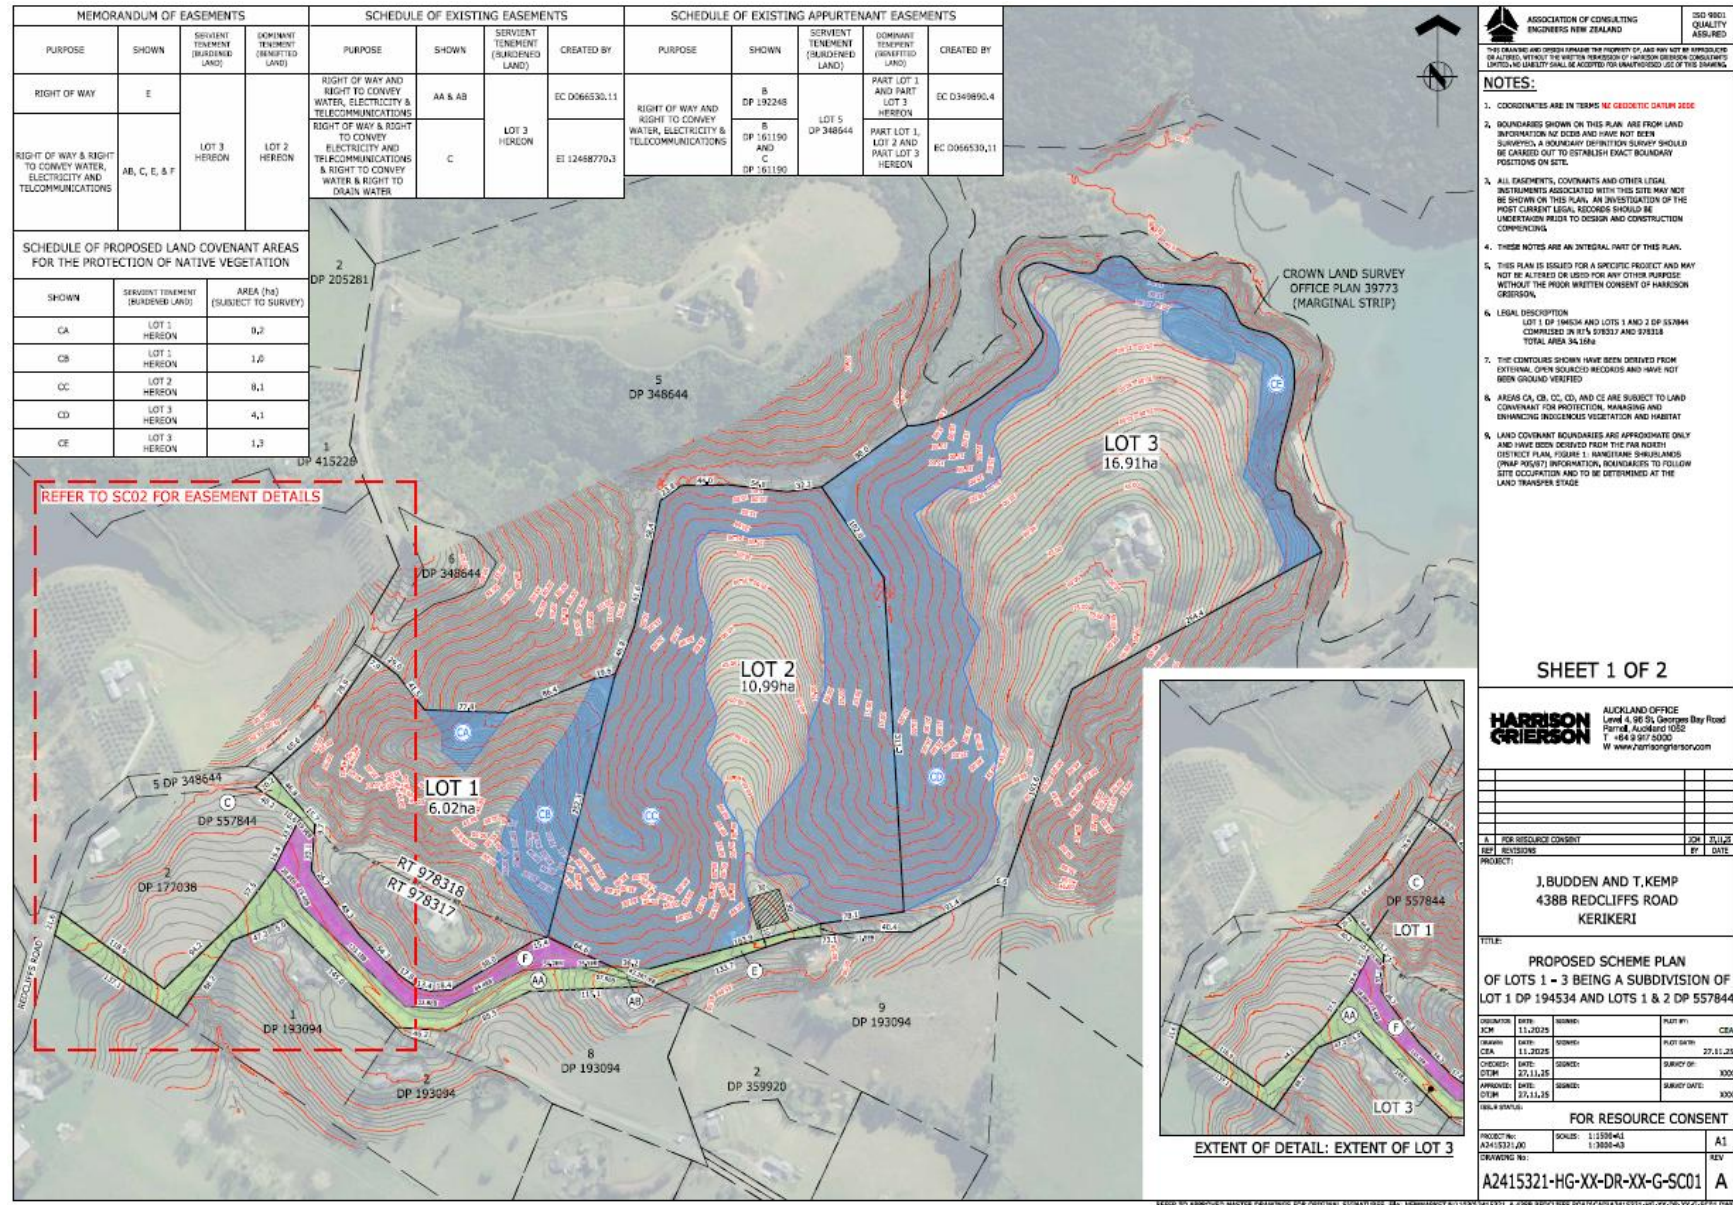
Scheme plan for the development and subdivision at the Site (438B Redcliffs Road, Kerikeri).
